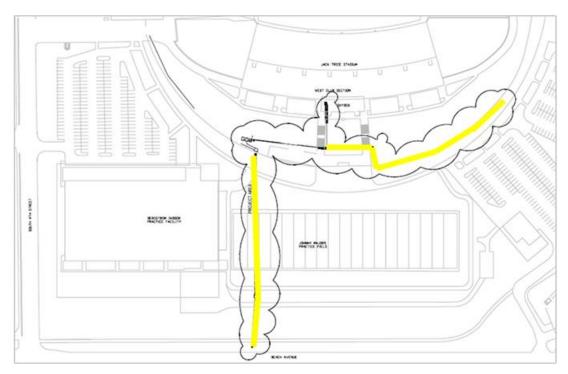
Plan view of the project site (bore path in yellow) taken from the plan set
